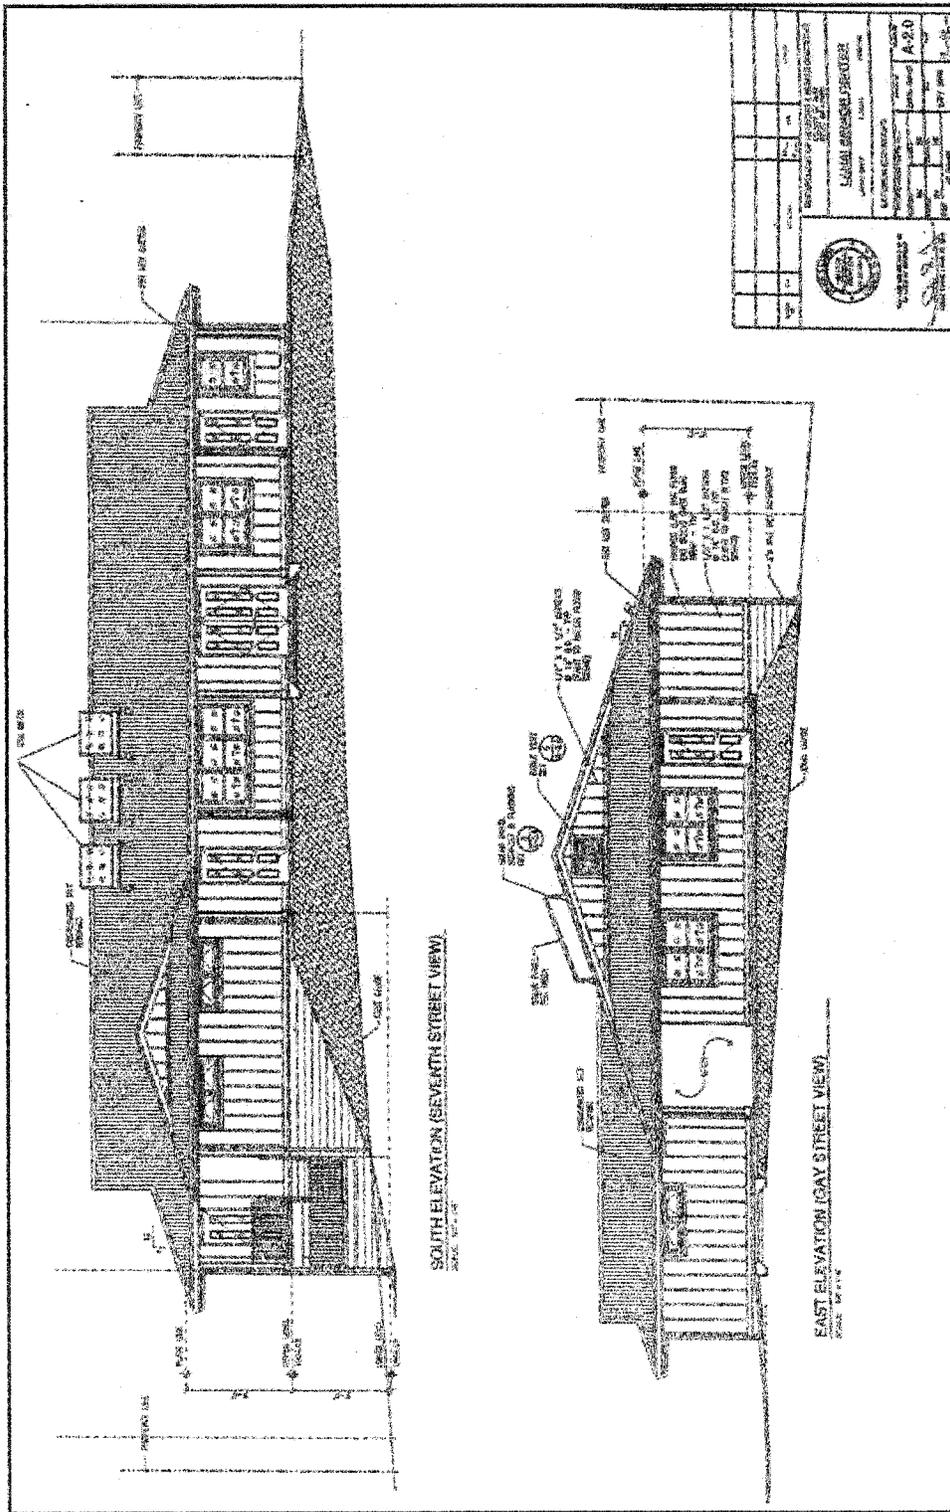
Street-level access to the proposed new senior center is shown in the south elevation. East elevation shows open overhang protected entryway. Design by the County of Maui Department of Housing and Human Concerns.
